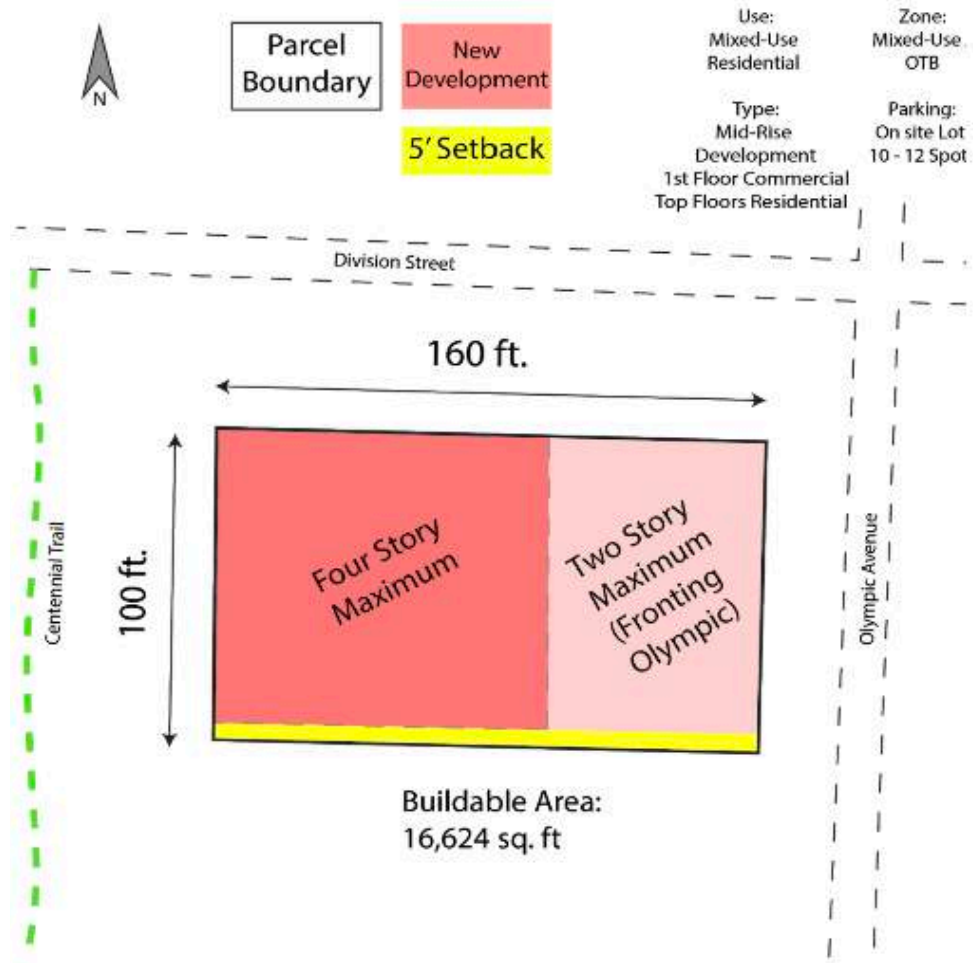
Basic site design for mixed-use development on 102 East Division Street & 540 North Olympic Avenue
